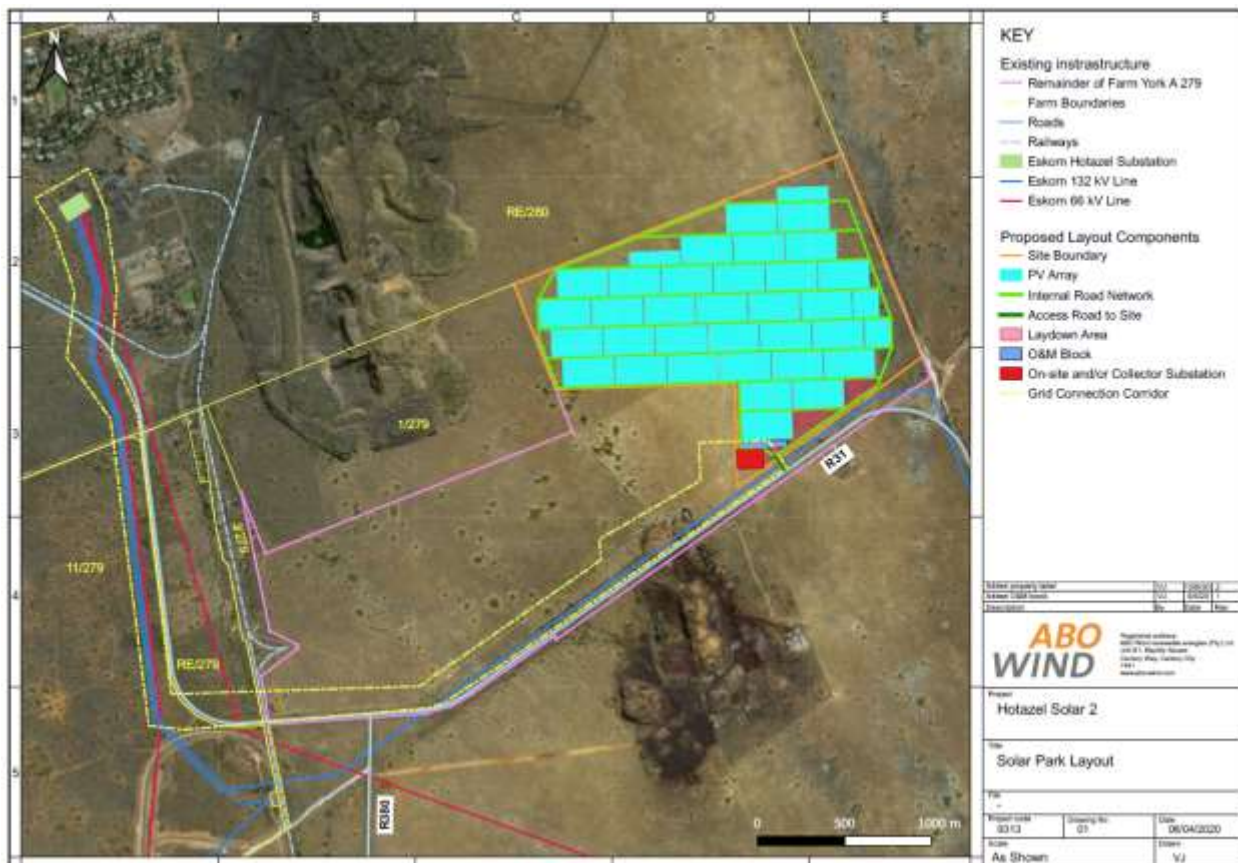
Layout of Hotazel 2, showing the location of the facility within the site as well as the grid connection corridor to the Eskom Hotazel Substation.
